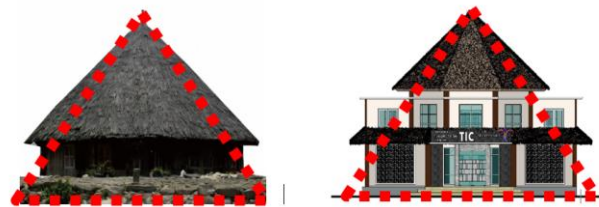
Maintaining The Shape and Proportion of *Mbaru Niang* in the TIC Building Design (Source: Author, 2023)
